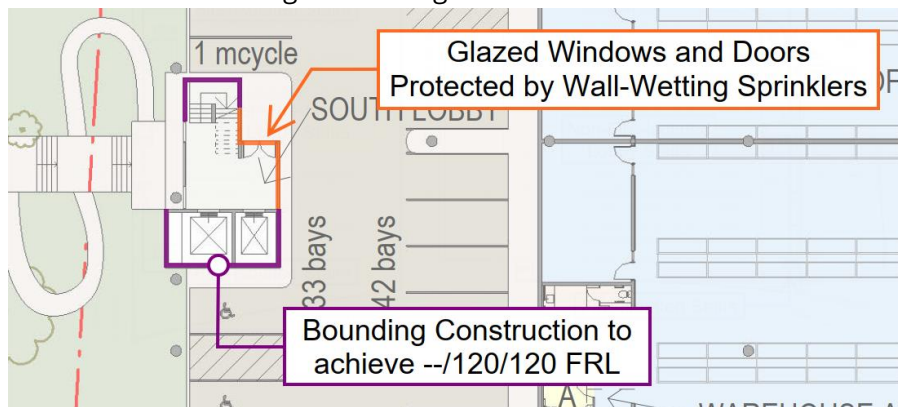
Fire Rated Bounding Construction to the Southern Office Lobby at Ground Floor Level
